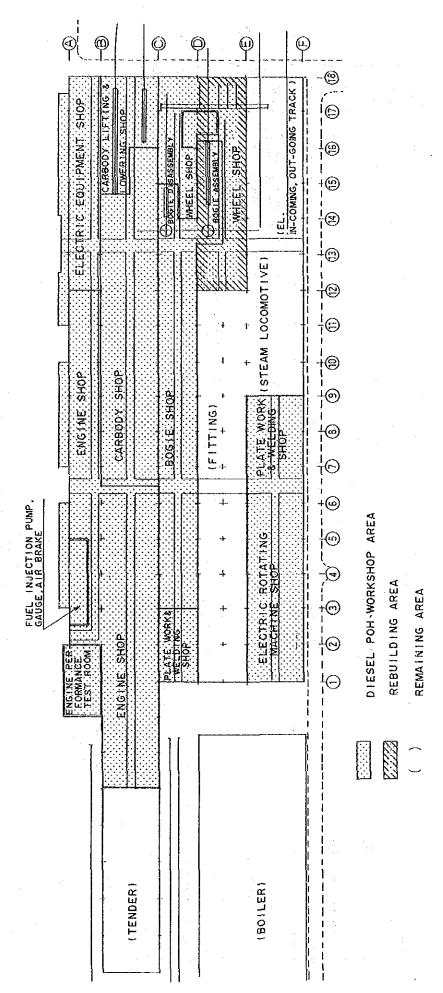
Workshop Layout Plan (Plan 2)
